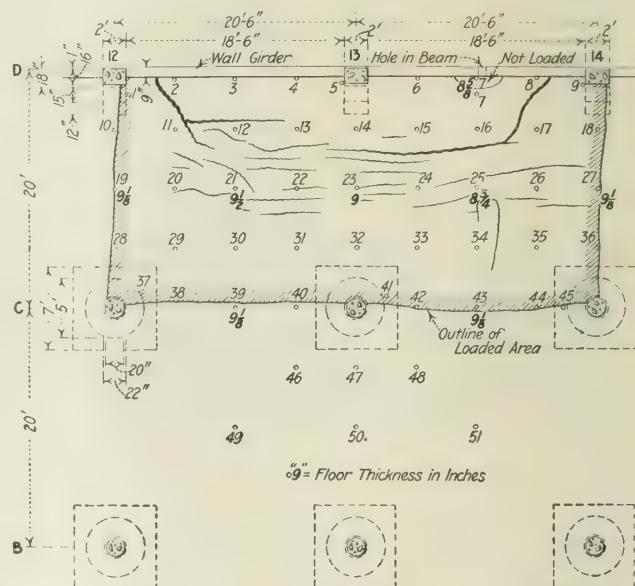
PART OF FLAT-SLAB FLOOR UNDER TEST WITH CRACKS UNDER MAXIMUM LOAD
